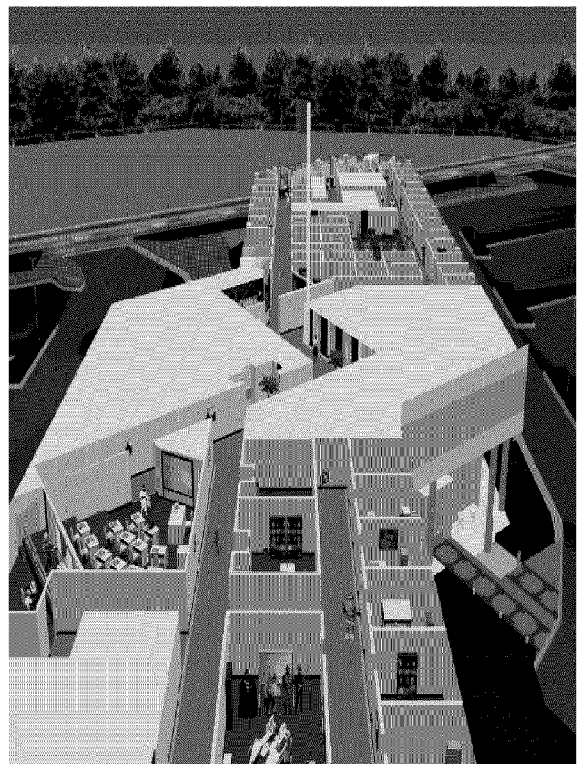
Aerial View of Third Floor Viewed at 98 feet
